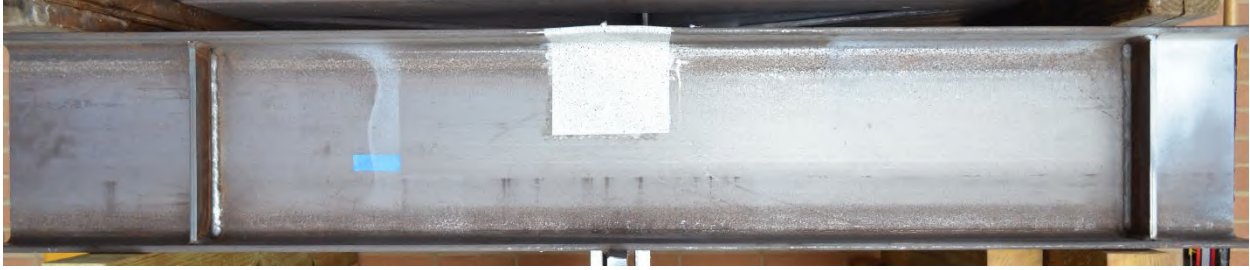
Elevation view of W10X39-ST-E0 prior to testing
